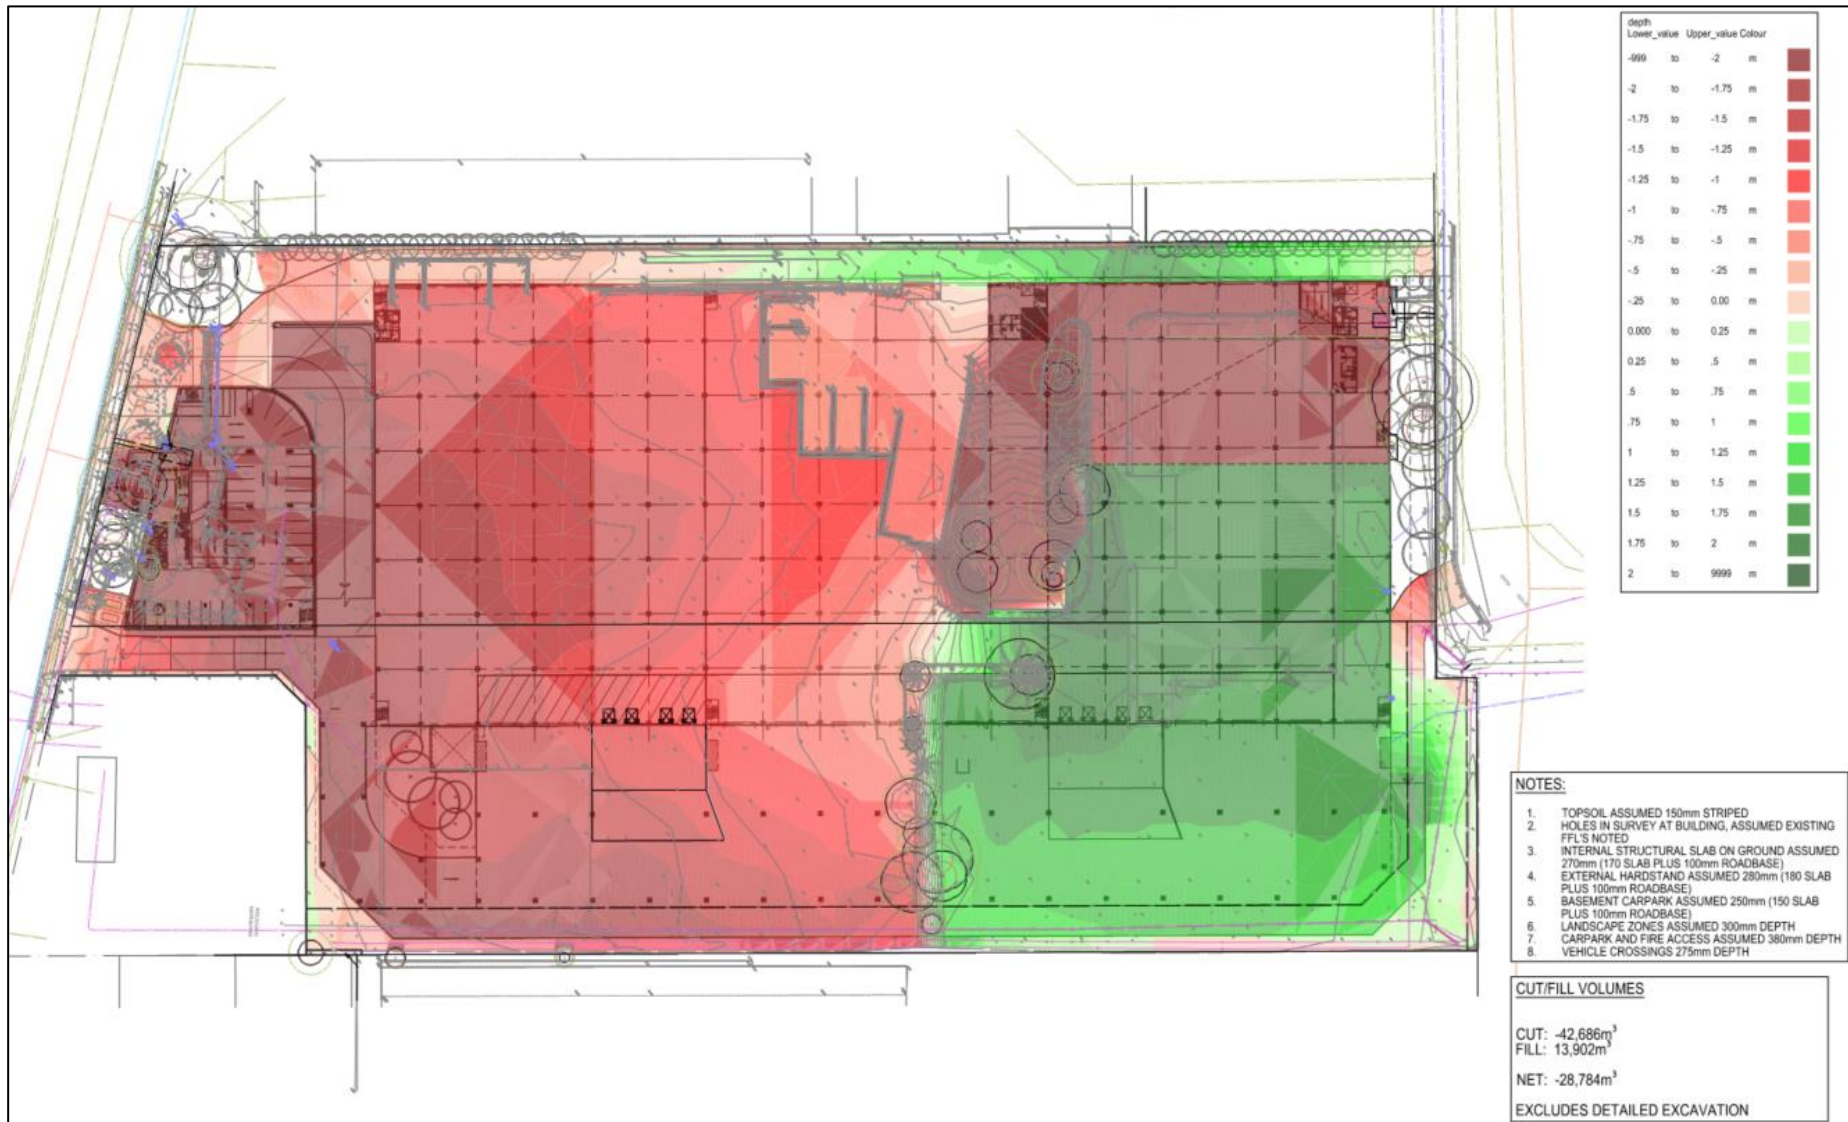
Proposed Bulk Earthworks Plan (Source: TTW, 2023)
